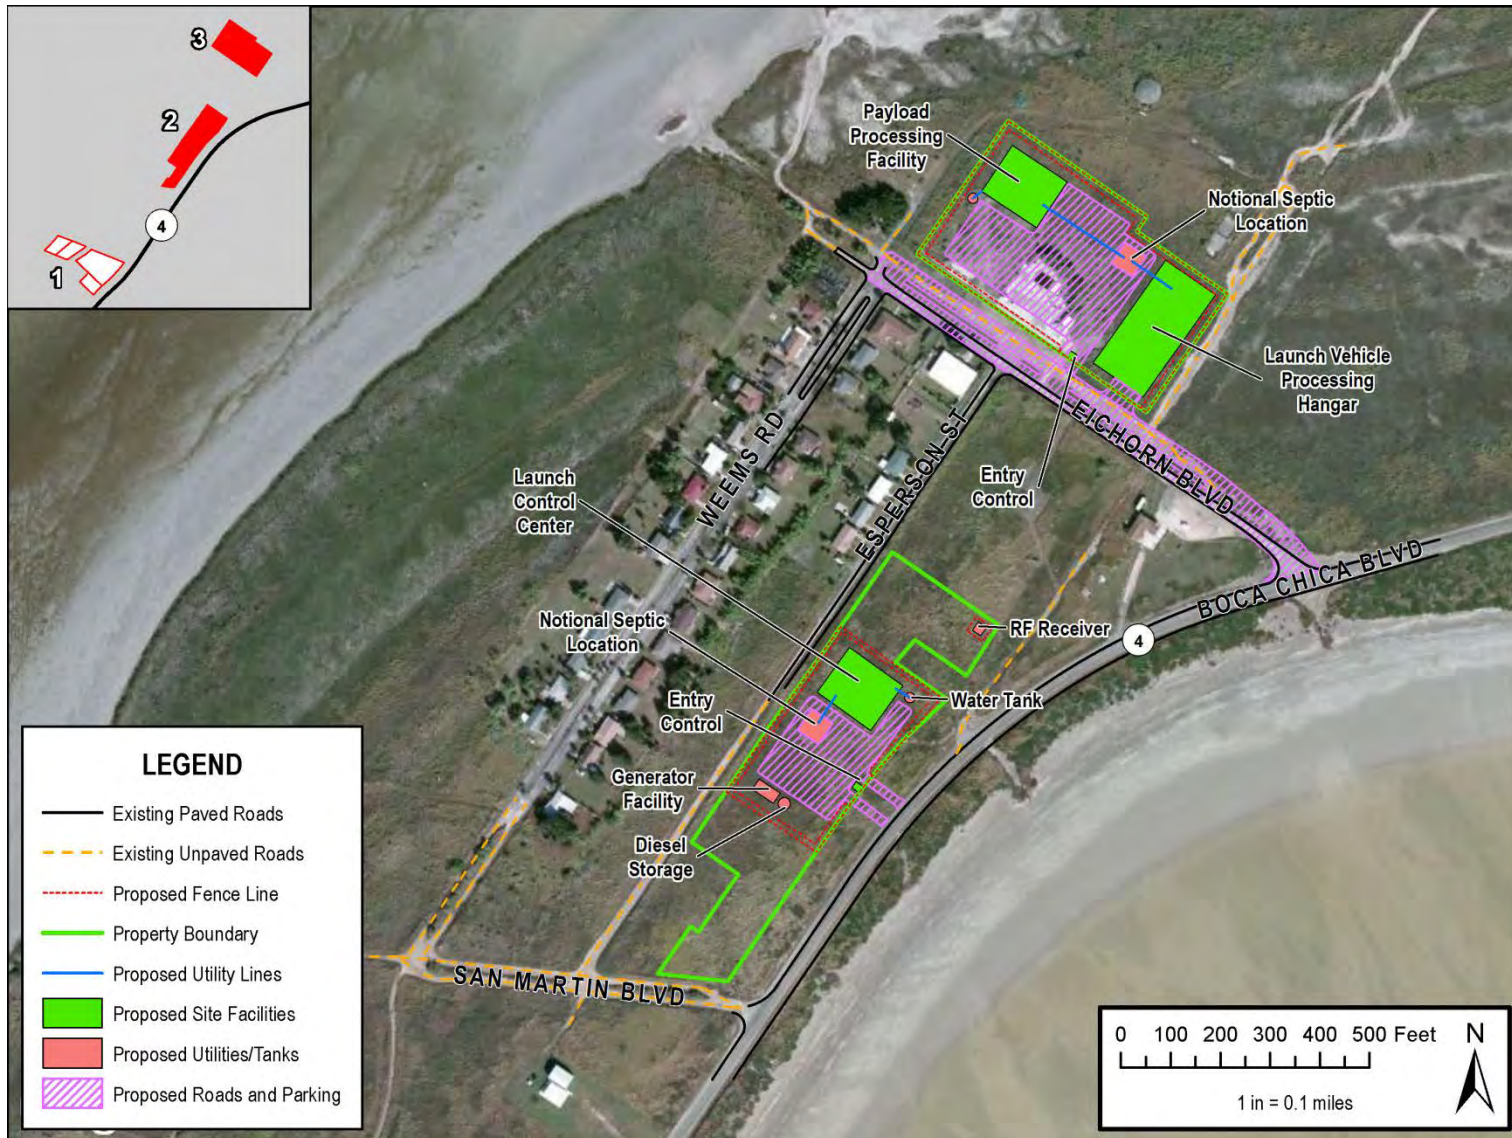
Control Center Area Site Layout – Parcels 2 and 3
